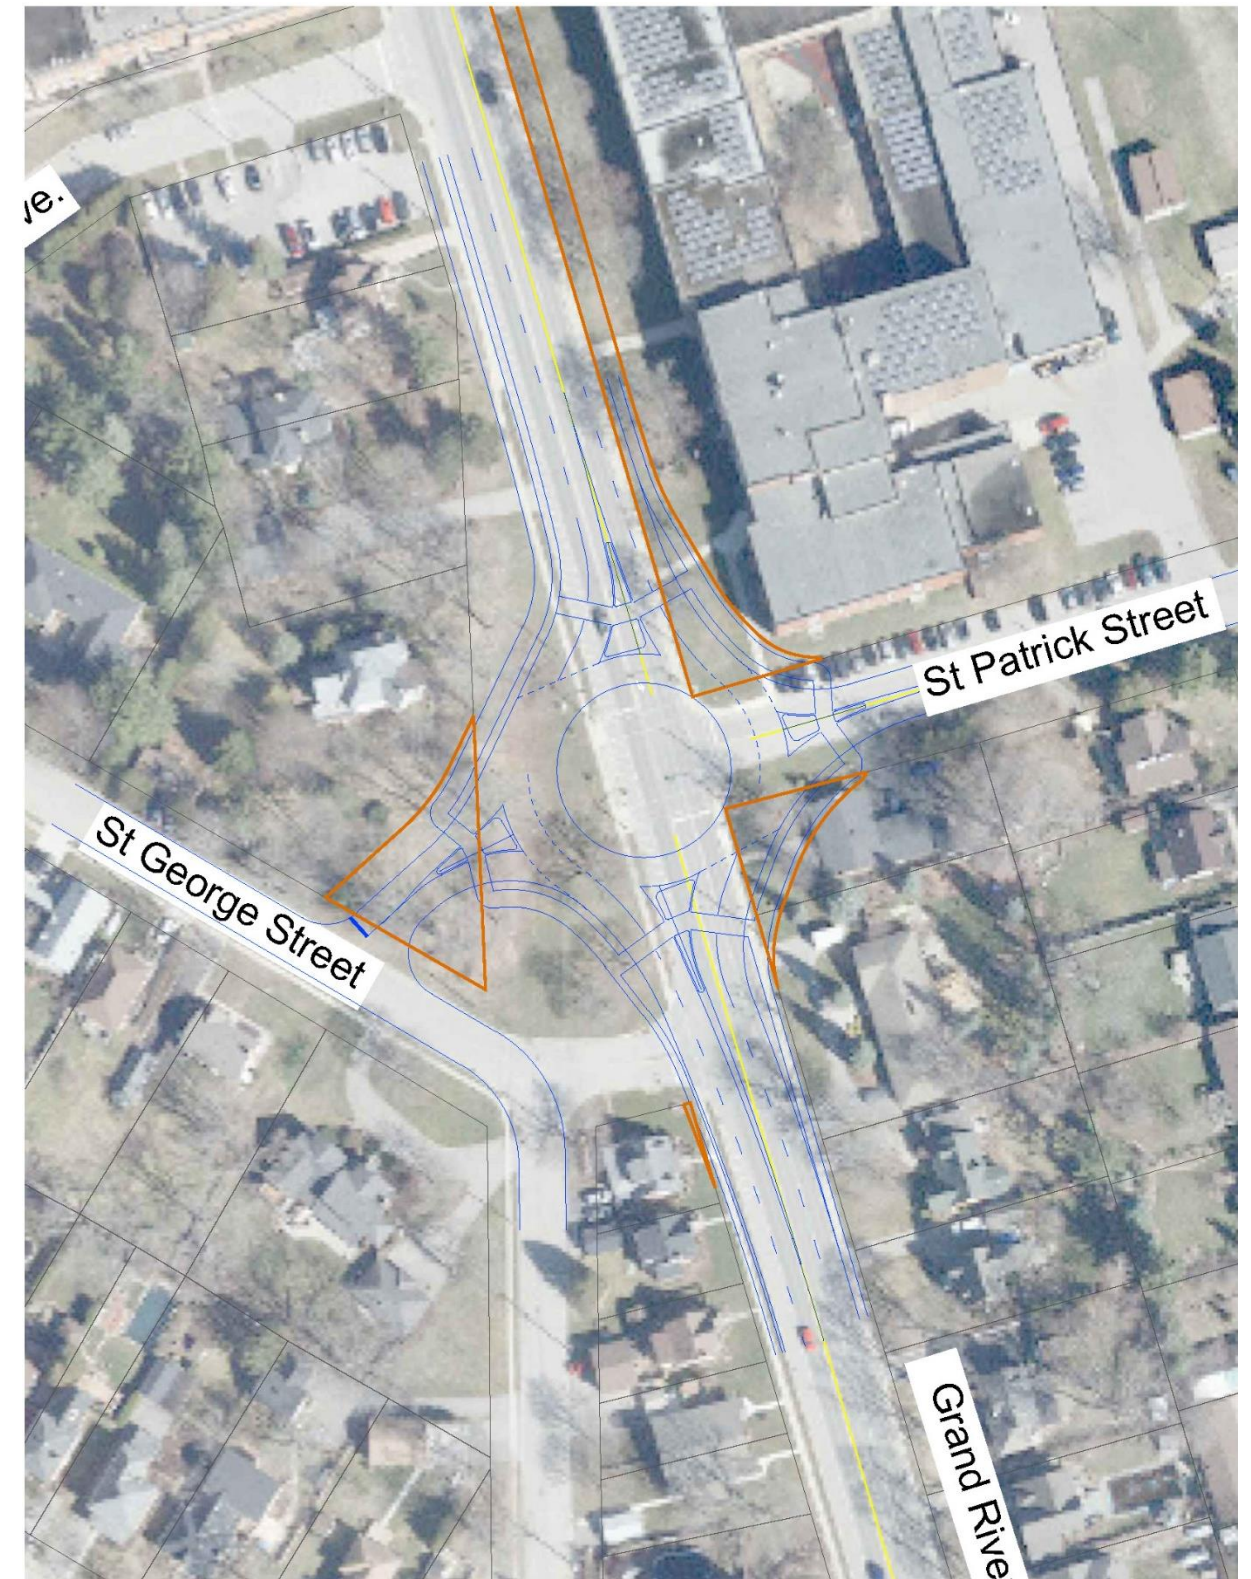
Refinement 6 – St. George Street Connection Alternative 3
